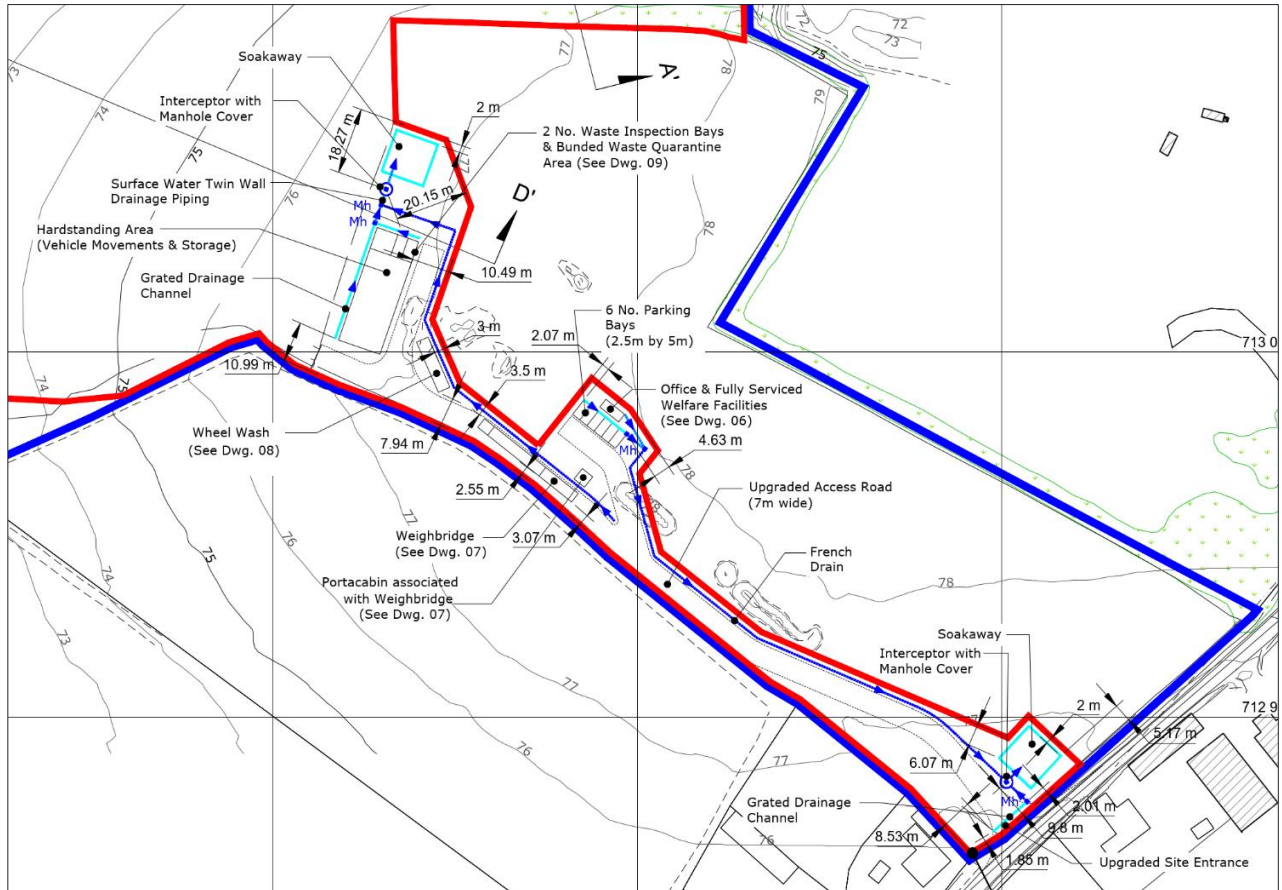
Proposed Project facilities and access upgrades⁵.
